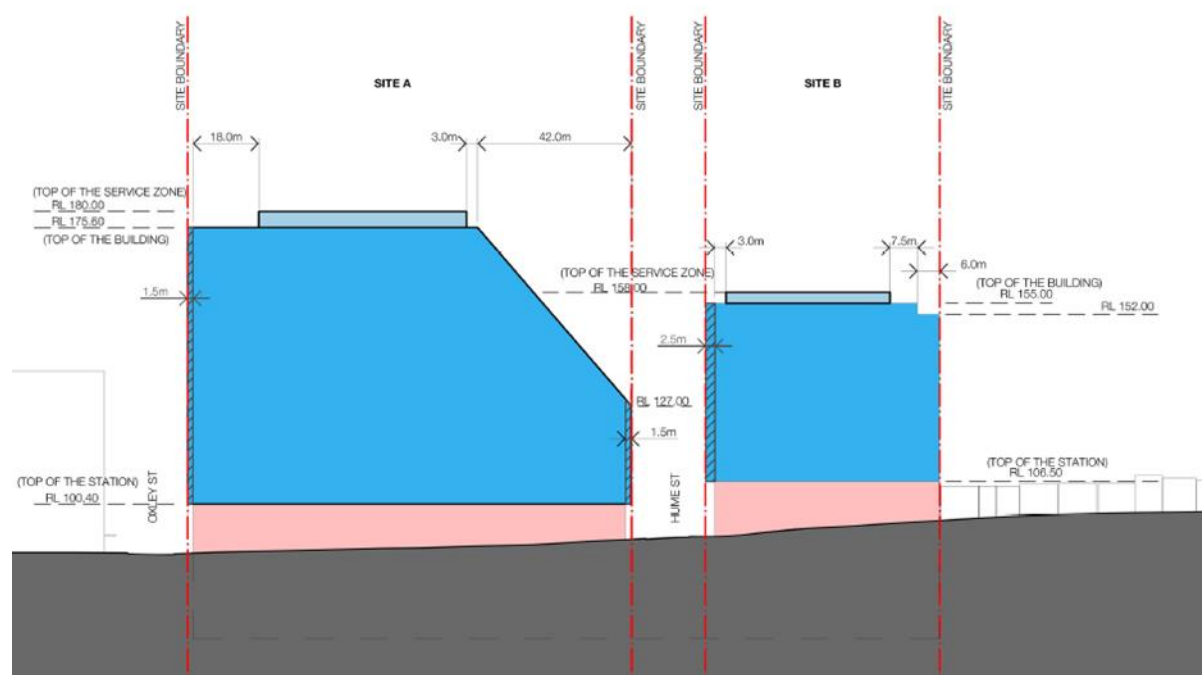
West elevation of the building envelope under the Amended Scheme, showing CSSI Approval (pink) and OSD components (blue)
